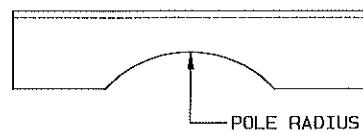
ANGLE ARM-(ACR4) - SEE NOTE 1
